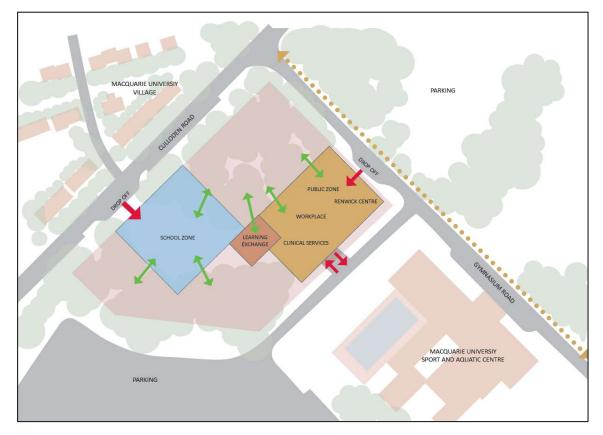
| Site analysis and layout (Source: Applicant's RtS 2021)
